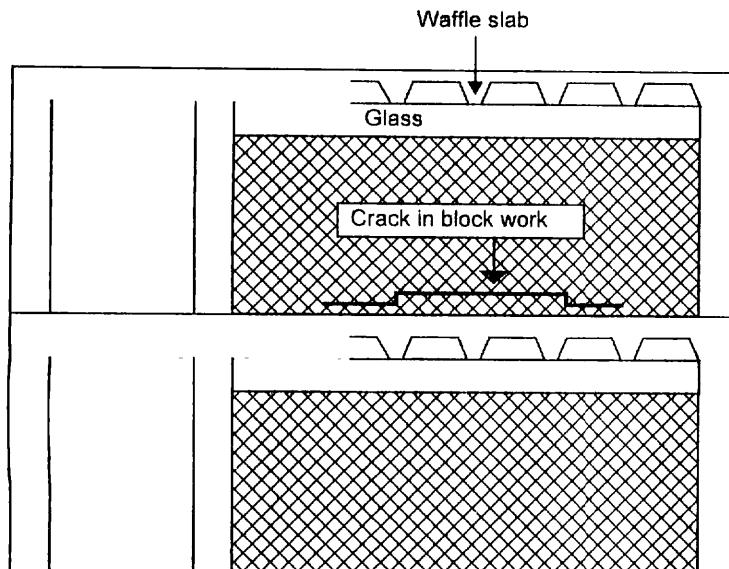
Damage to masonry partition wall due to deflection
